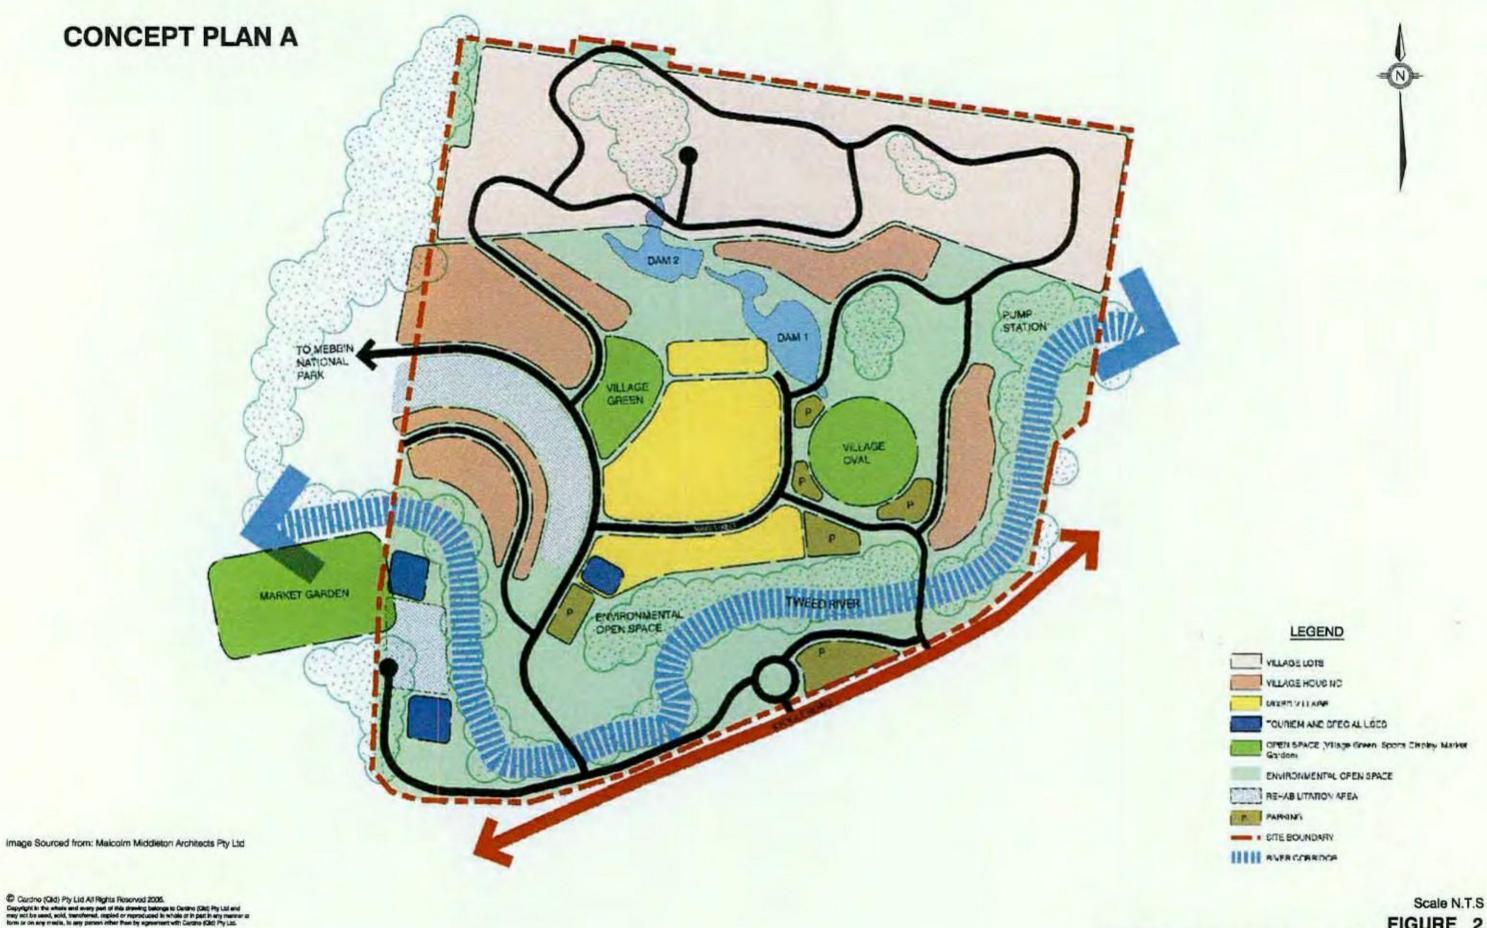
PROPOSED PLAN OF DEVELOPMENT
